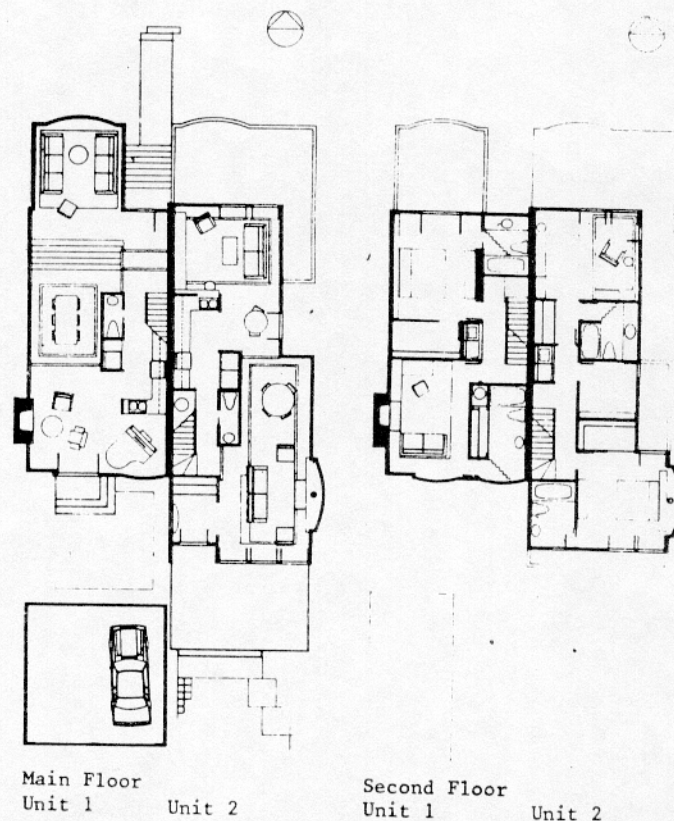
Main and Second Floor Plans of Experimental Townhomes
